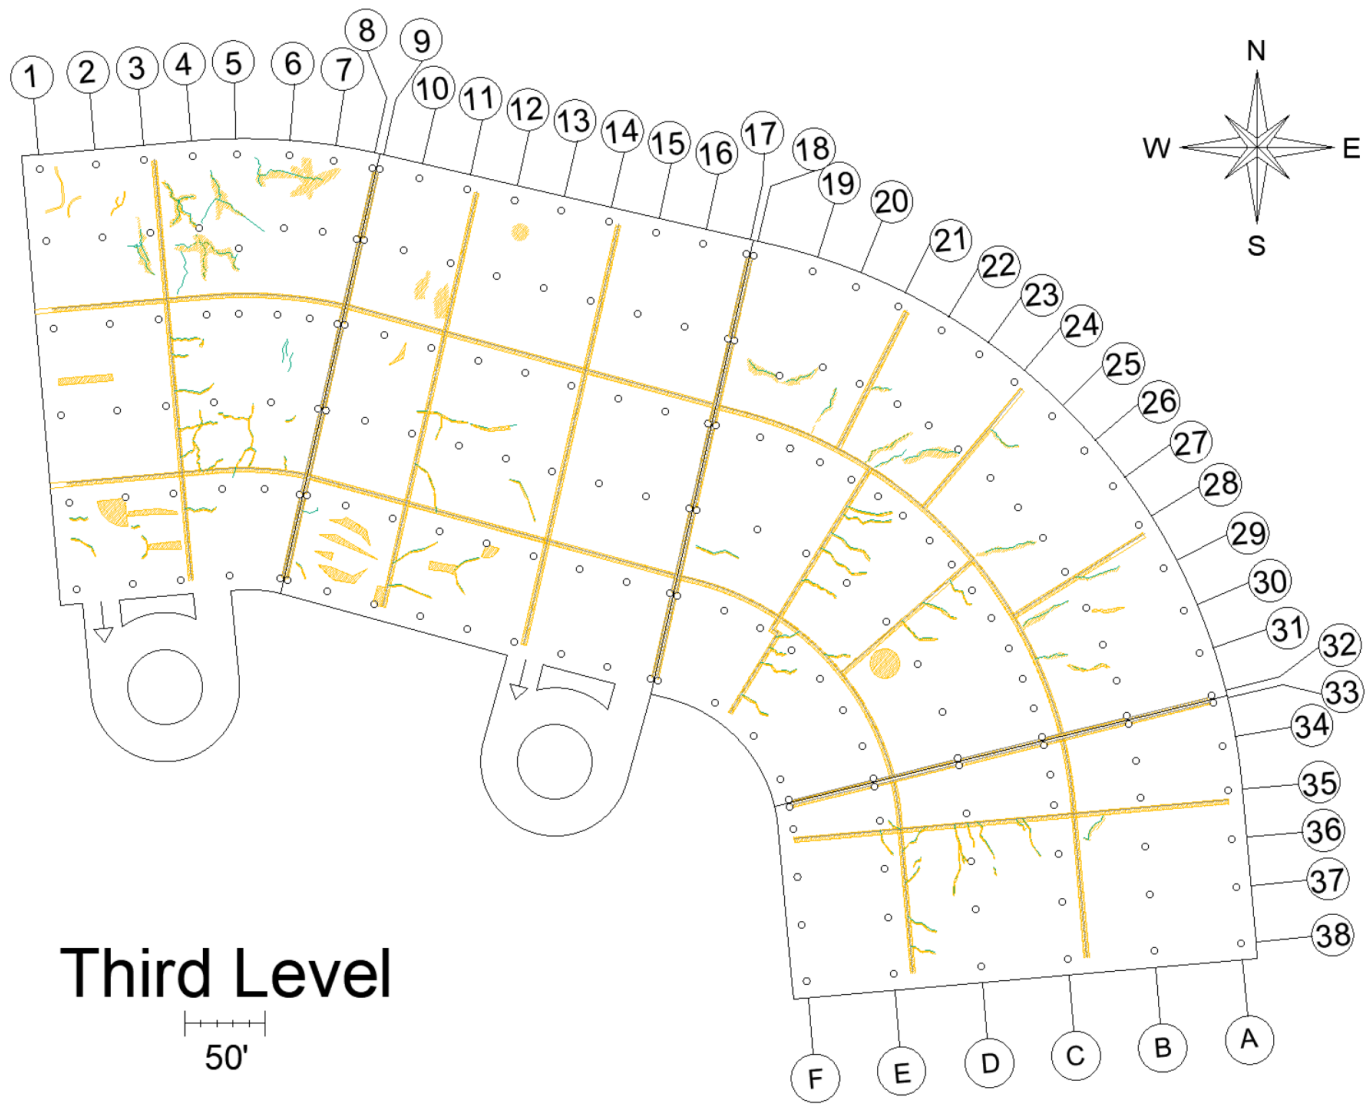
Crack map of the second suspended, reinforced silica fume concrete slab with green bottom-up cracks, yellow zones of efflorescence, and gray un-cracked epoxy-filled construction joints.
